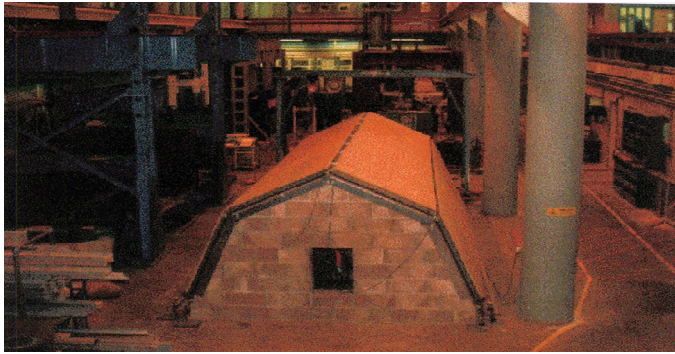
PSSDB folded roof structure tested by Wan Badaruzzaman.
